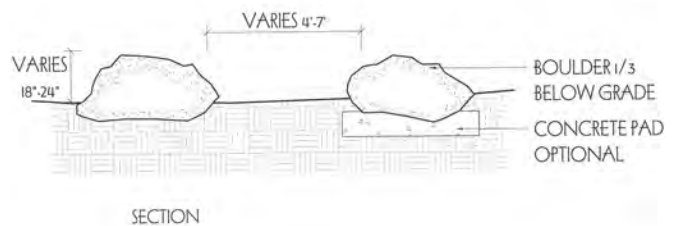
Section showing boulder roadside barrier installation. Approximately one-third of each boulder should be placed below grade.
